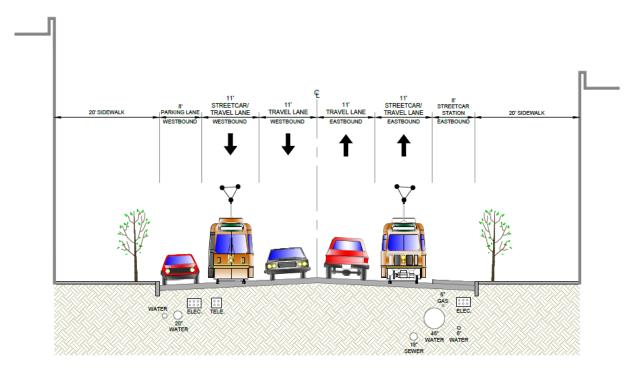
Typical Cross Section along Atlantic Avenue (at Clinton Street)
